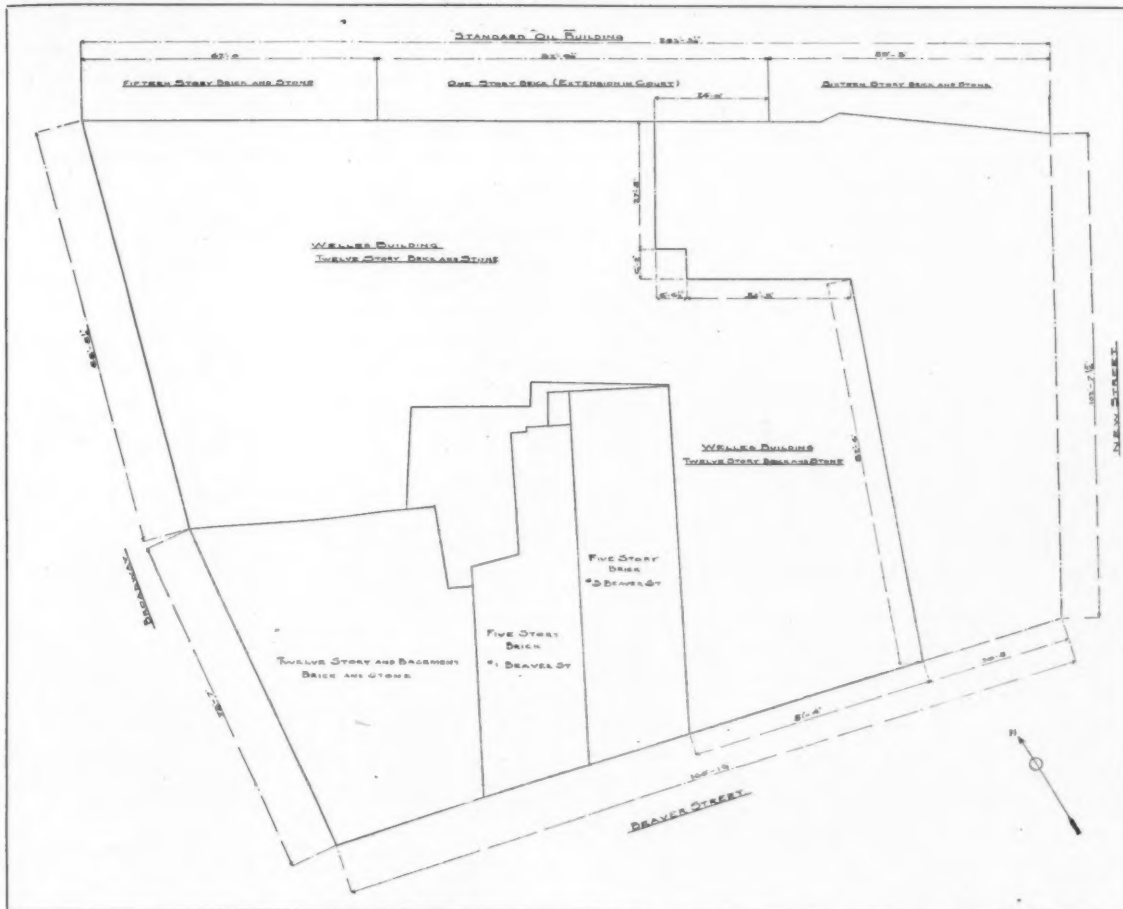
Site of the new Standard Oil Building, New York City. Section One is the property fronting on Beaver Street and New Street. Section Two includes the Beaver Street wing of the Welles Building.
